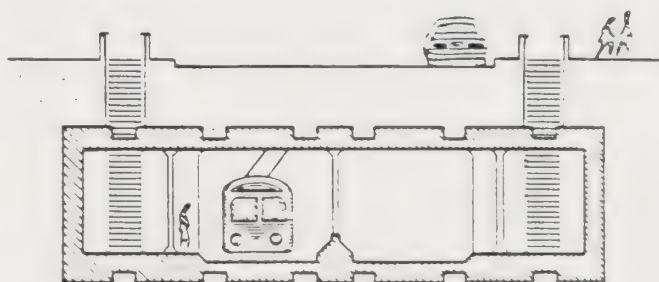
CROSS SECTION OF SHALLOW SUBWAY
